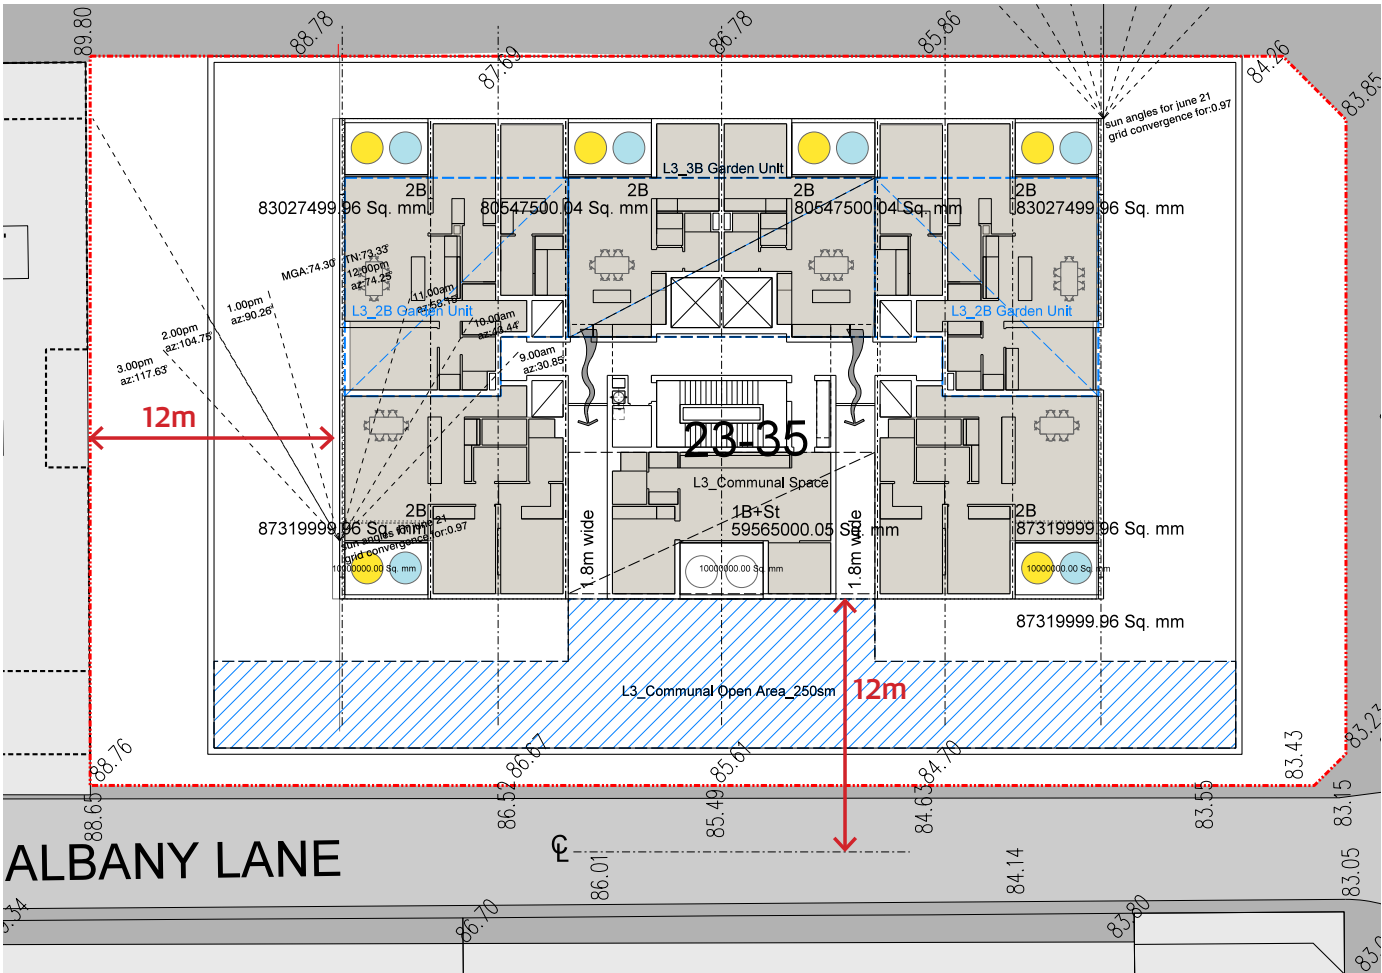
Indicative Floor Plan Layout Of The Tower
